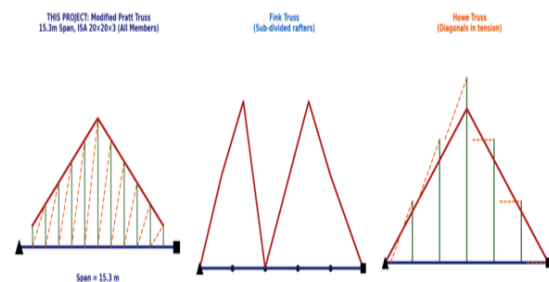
Three Common Styles of Steel Roof Trusses: Howe, Modified Pratt, and Fink
